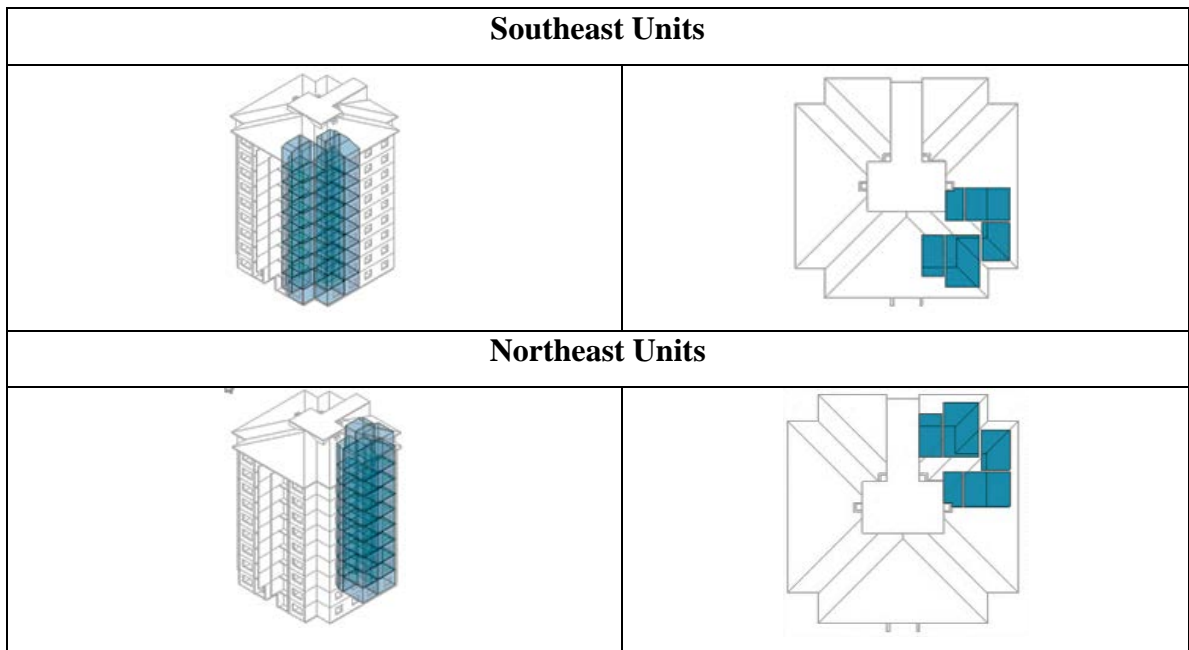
Southeast and Northeast Unit's Location in the Building
